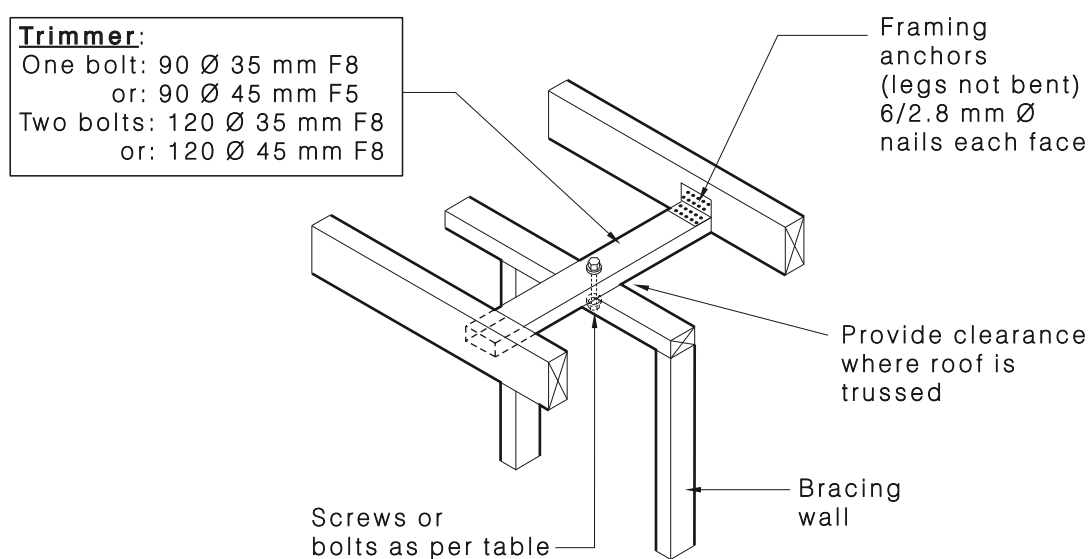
BRACING DETAIL FOR I-JOIST TO INTERNAL WALL
